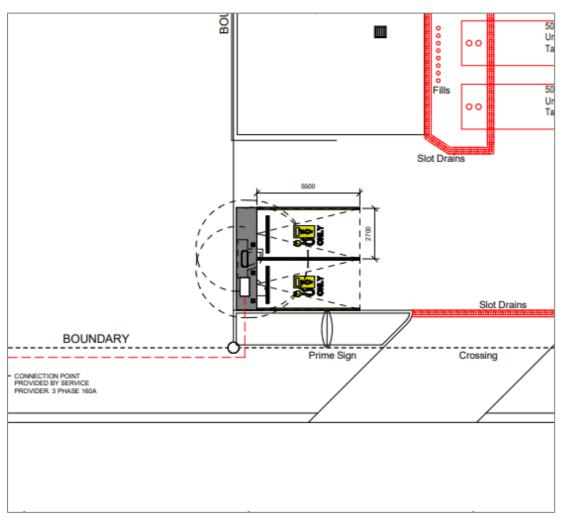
Part Proposed Site Plan showing location of the EV infrastructure adjacent to the internal side boundary of the site but marginally set back from the front road boundary. The existing landscaping and Z Energy sign just inside of the road boundary is to be retained.
